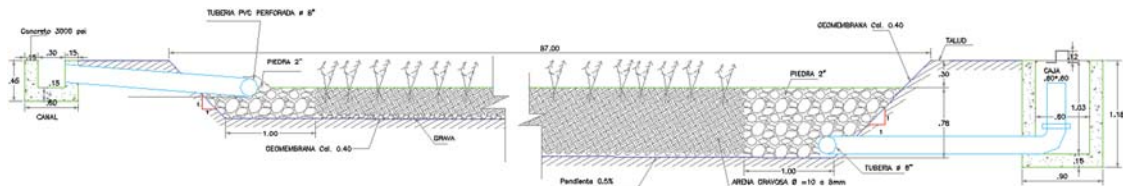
Longitudinal cross section of a typical SSFCW unit
